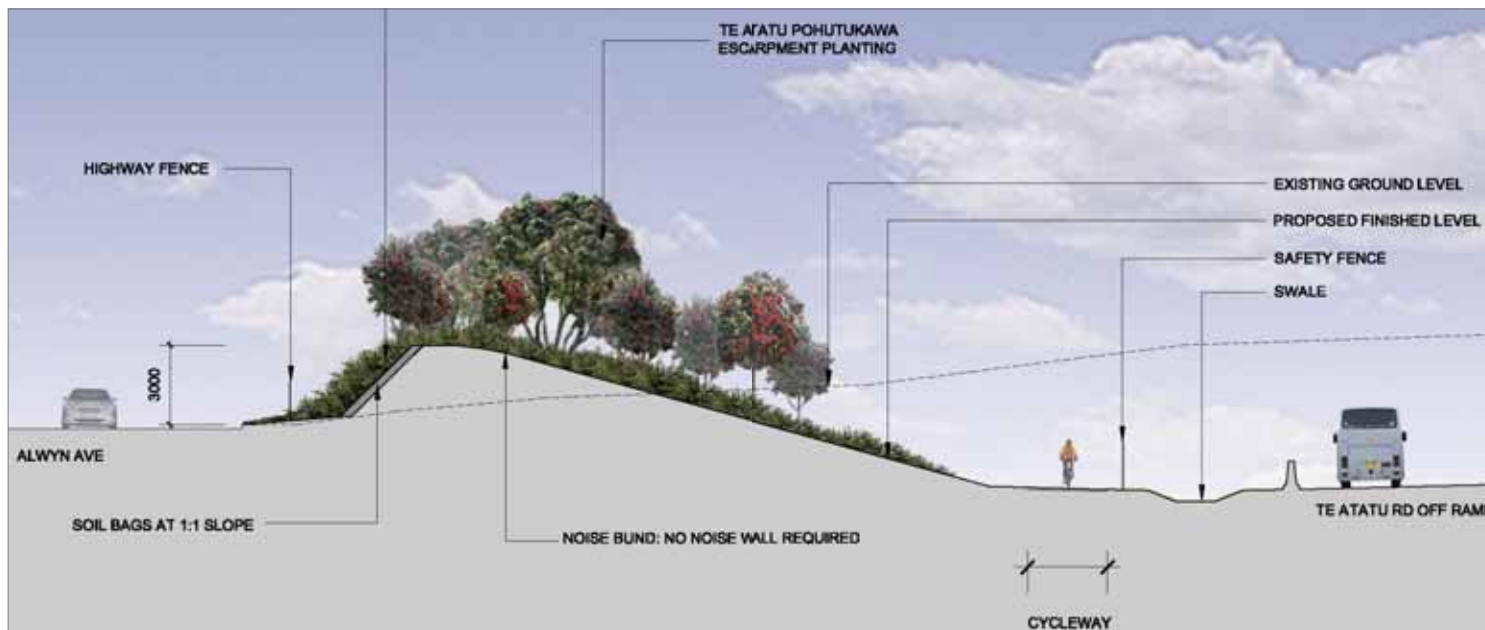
Future cross-section at interface between Alwyn Avenue, cycleway and westbound traffic
